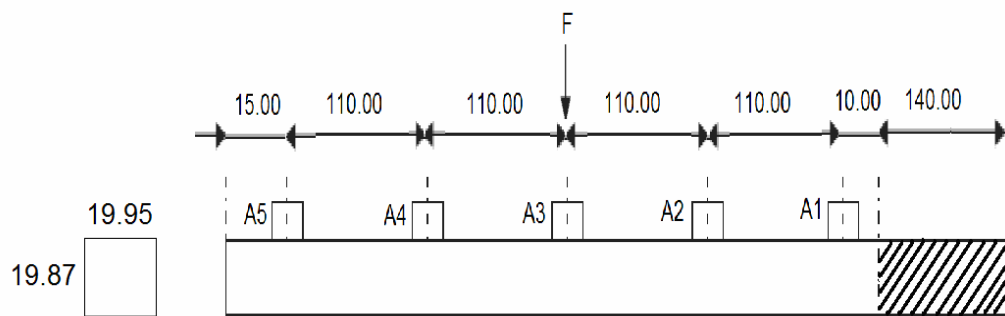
Schematic drawing of the test beam (All dimensions are in mm)
